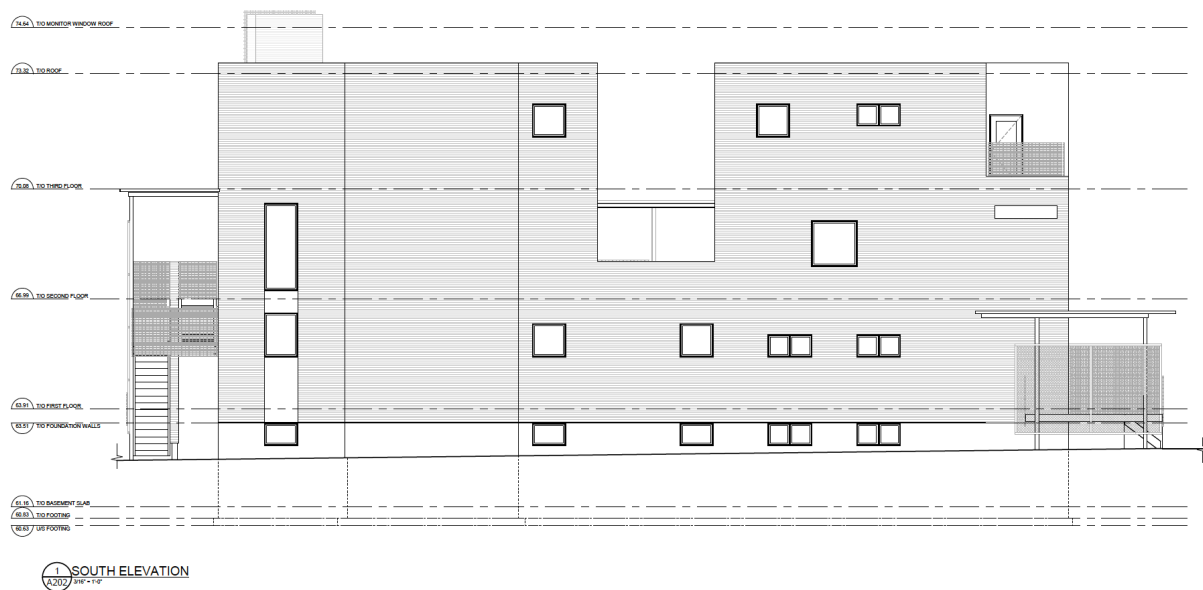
South Elevation (Source: Colizza Bruni Architecture)
